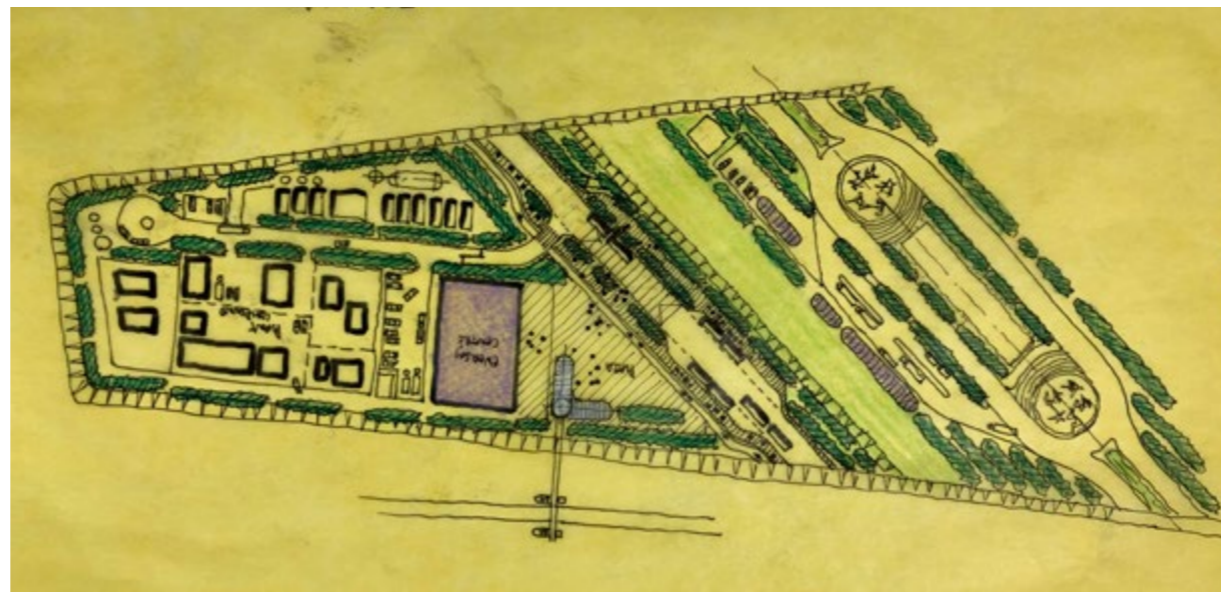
Masterplan Sketch - Sports Ground Back of House
